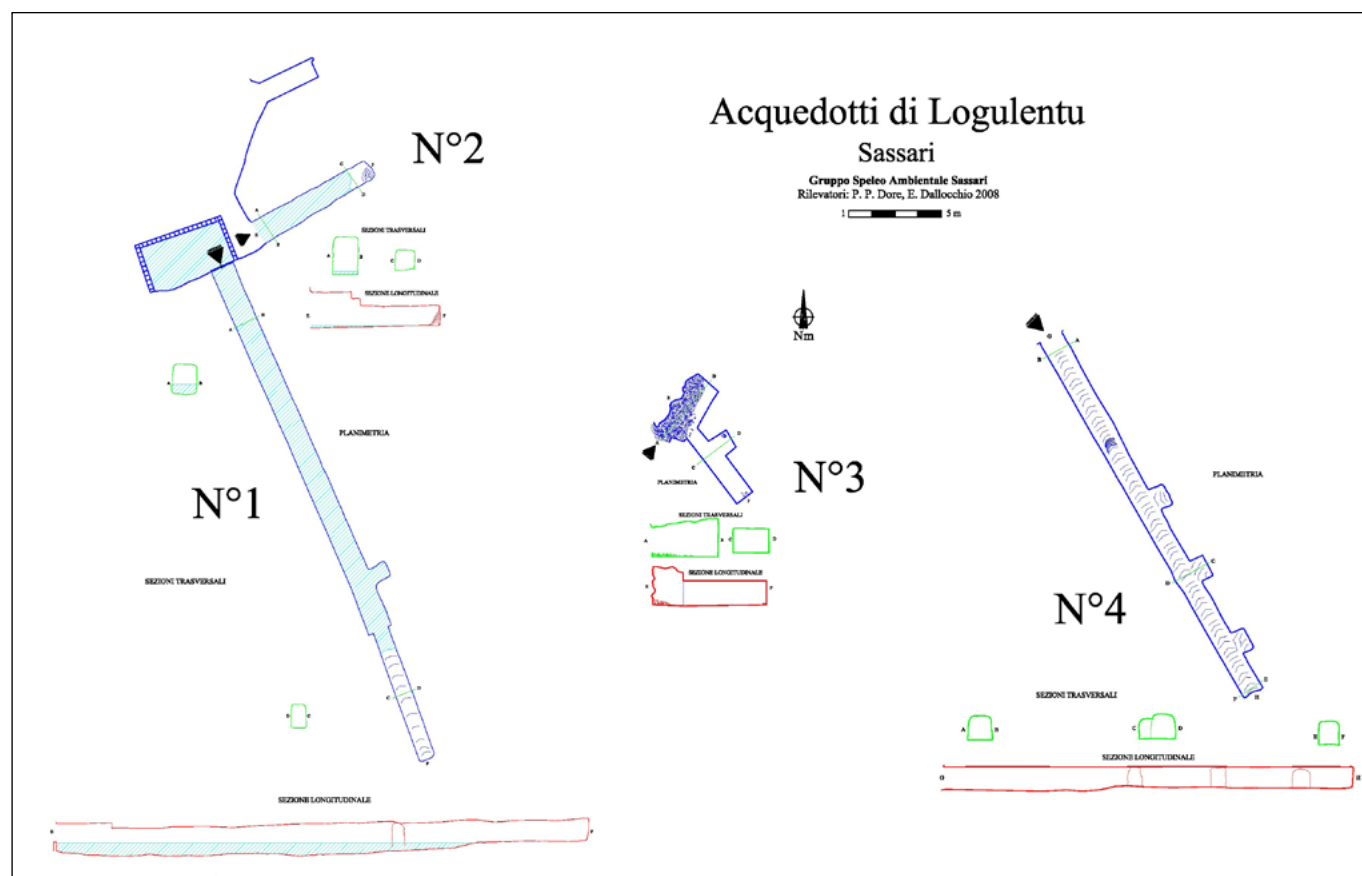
plans of the aqueducts. Fig. 4: planimetrie degli acquedotti.
